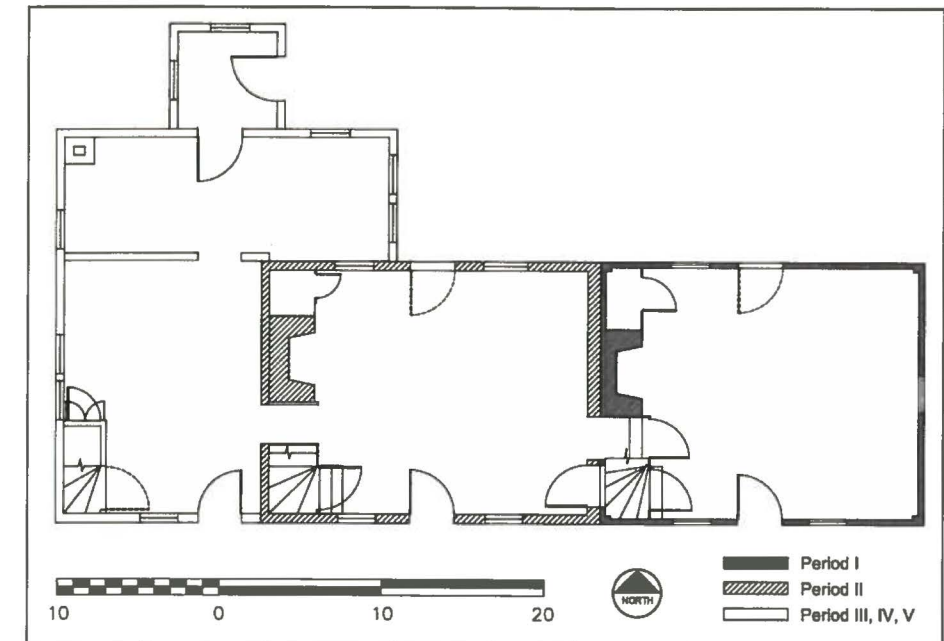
Watson House Floor Plan. The Hall-Form Period I House Dates from 1830 or Earlier. Period II was Probably a One-Story Period I Kitchen Raised to Two Stories. Until 1906 it Had No Ceiling on Either Floor.
